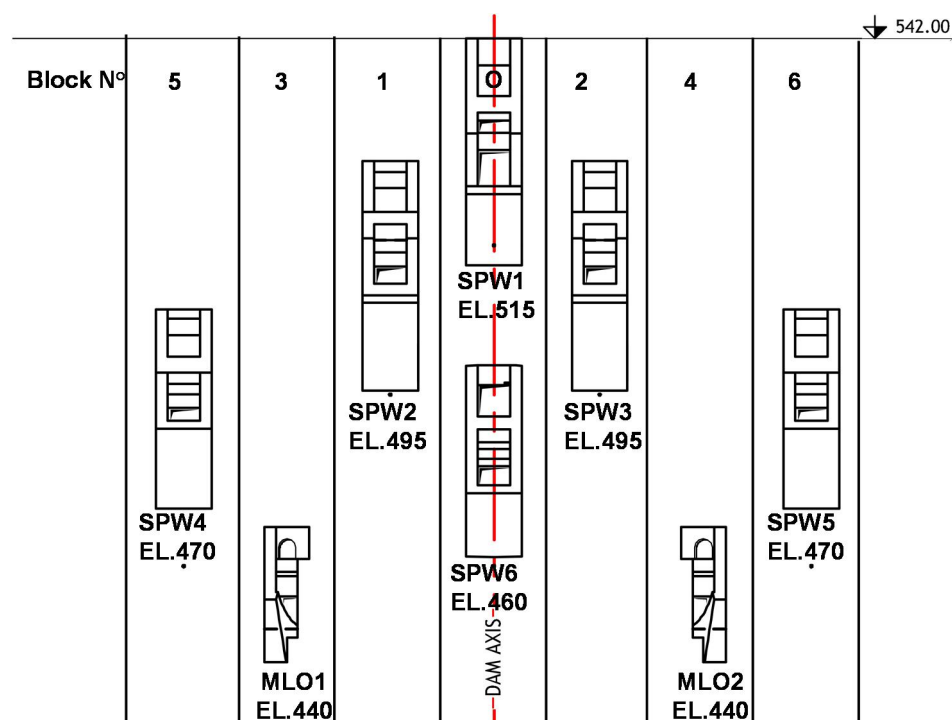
Illustrative downstream elevation view of the dam - Spillway and mid-level outlets arrangement.
